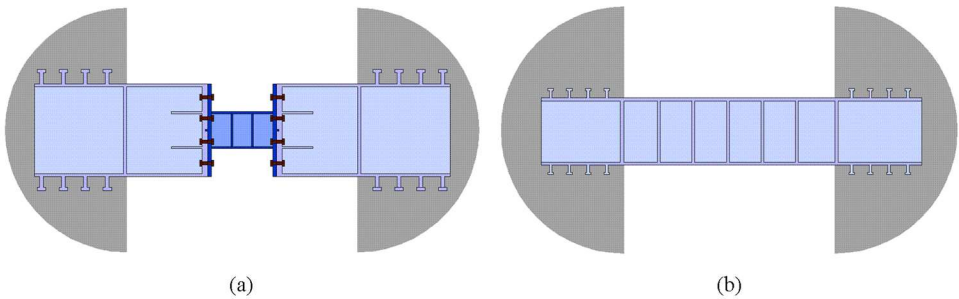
(a) Replaceable steel coupling beam (b) Typical steel coupling beam
